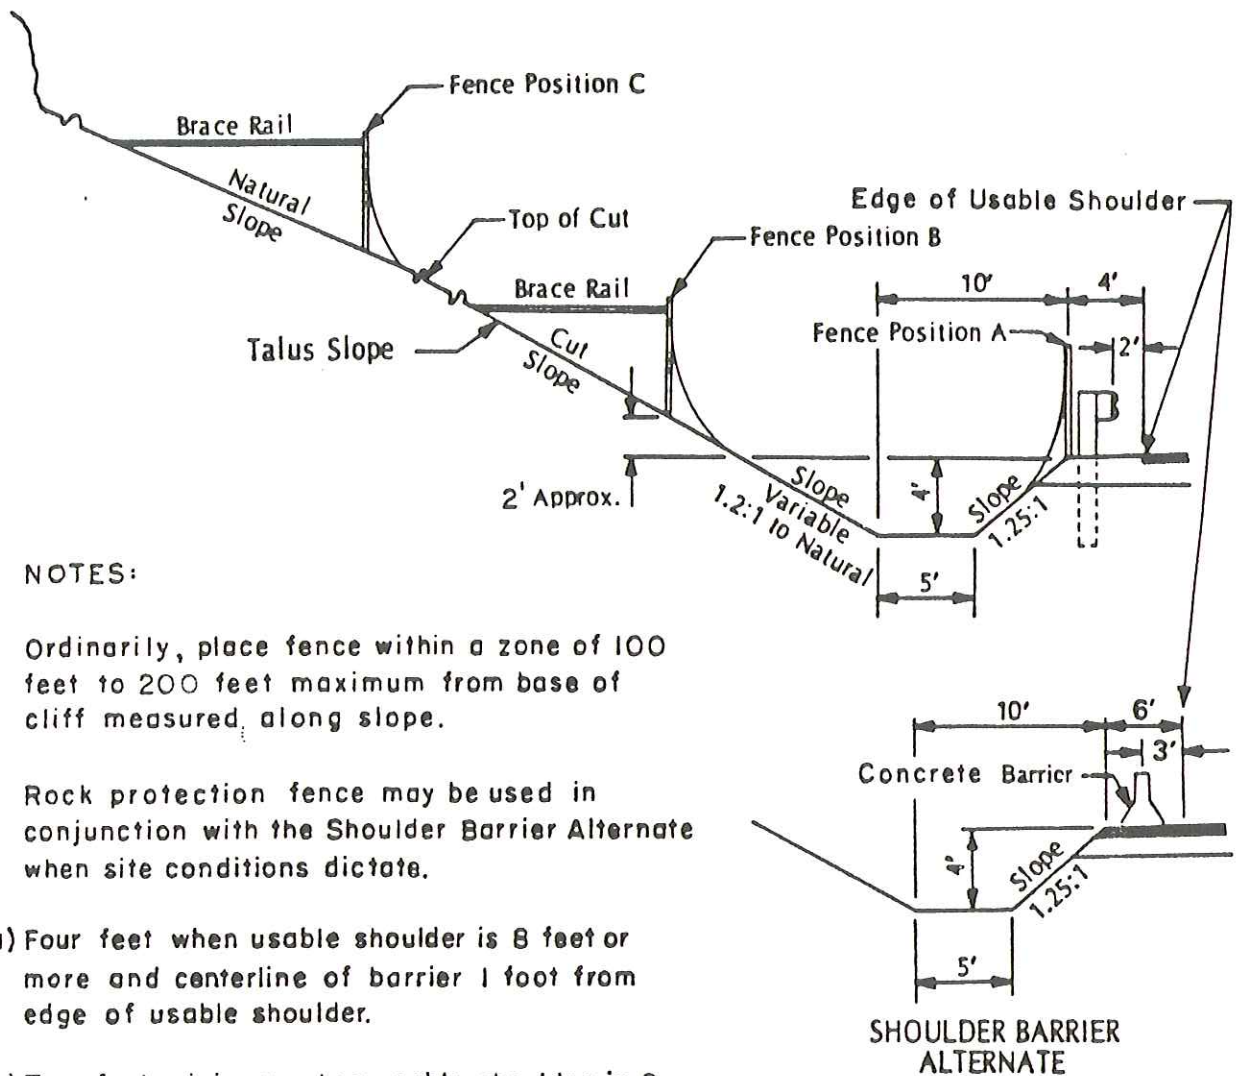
Roadway sections in rock cuts, design B (TALUS SLOPES) (Courtesy Washington State DOT Roadway Design Manual (1986).
